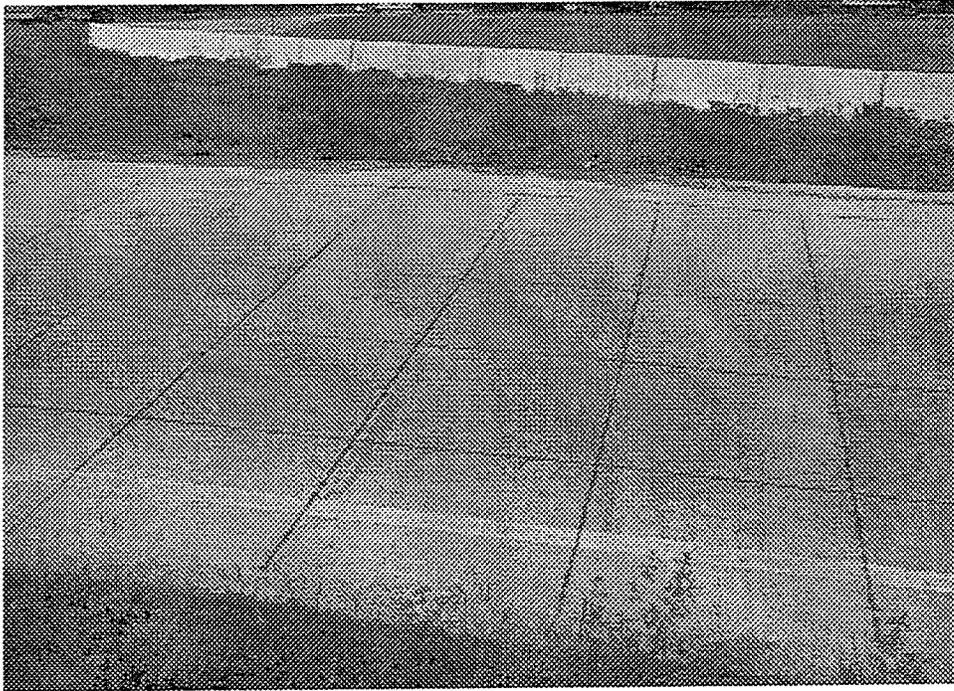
Joints that were sawed while the concrete was too green have not deteriorated significantly since being opened to traffic.
